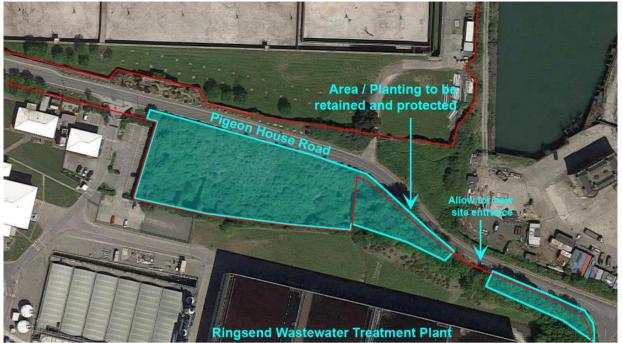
Aerial Photograph showing landscape areas / planting for retention and protection
